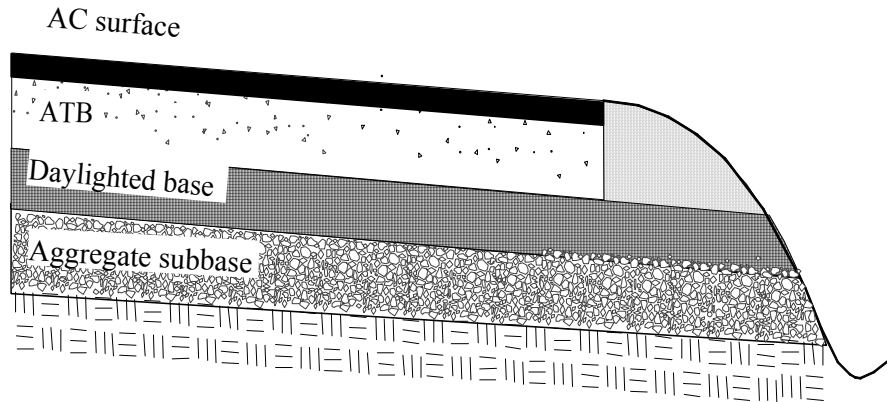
Typical AC pavement with a daylighted base (ERES, 1999).
